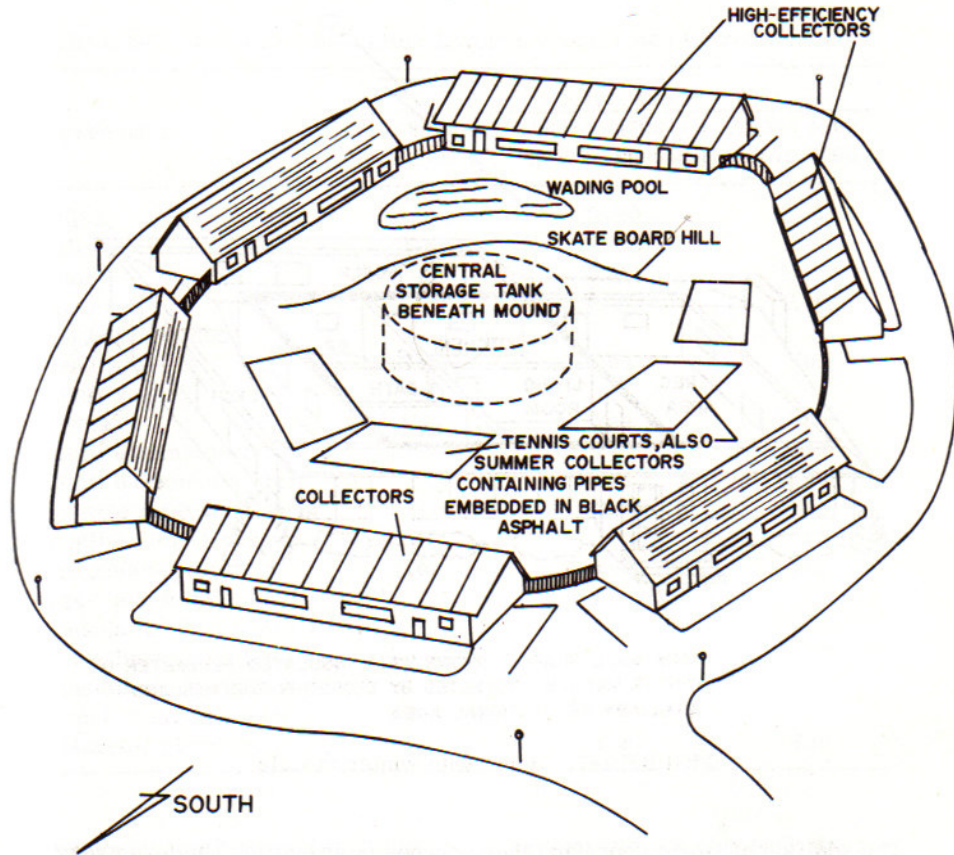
Multi-unit complex sharing a central storage facility. Units with roof collectors have short term storage tanks. Surplus heat is directed to the central storage tank.
